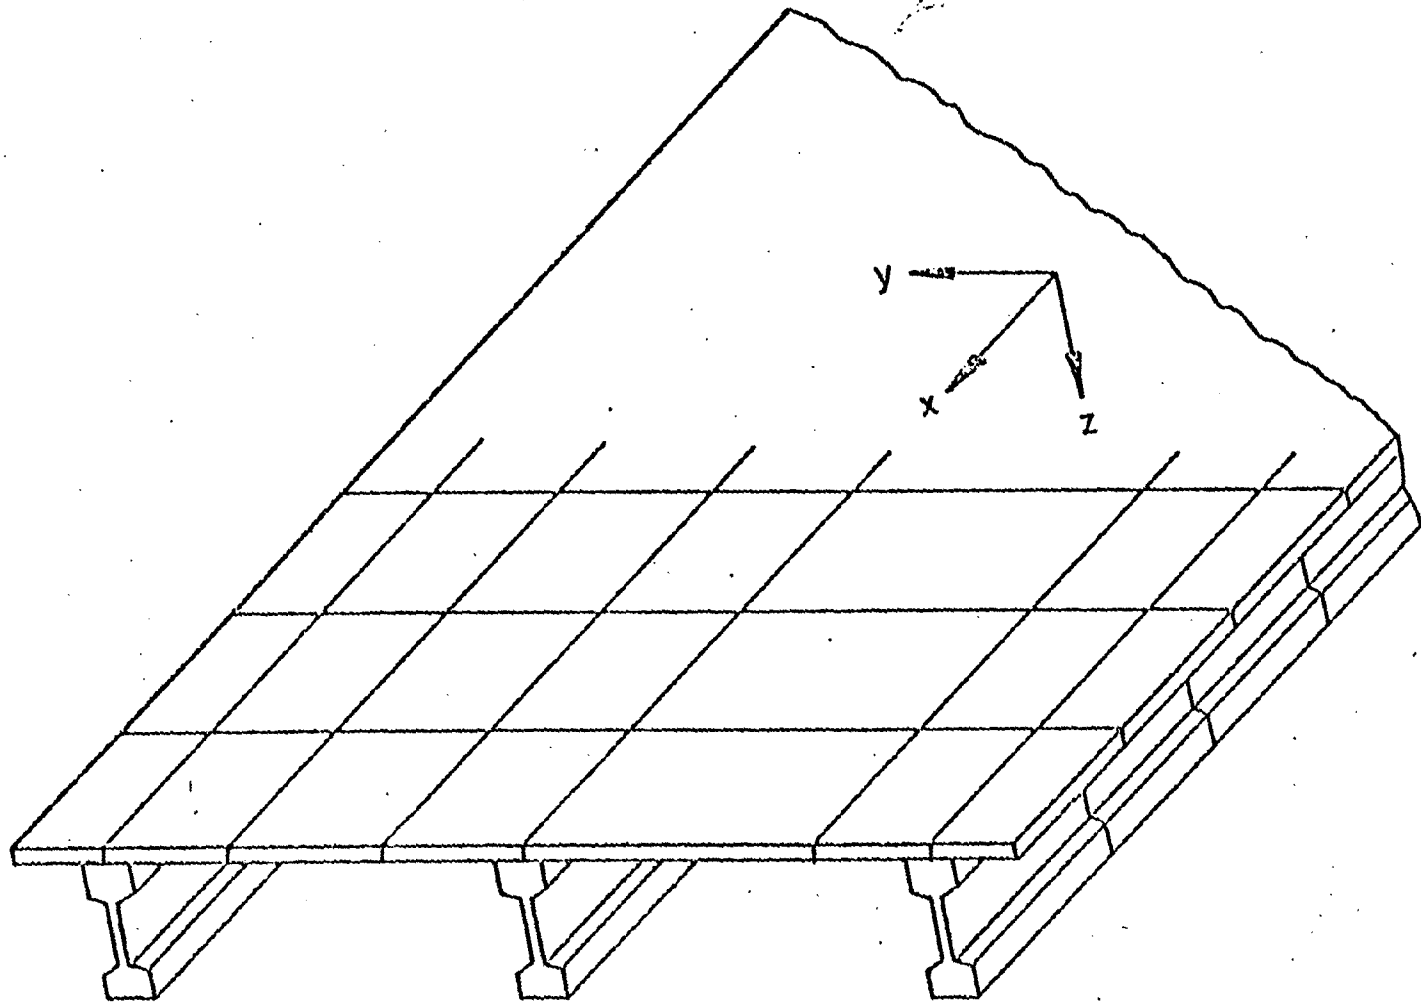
Finite Element Discretization of a Prestressed Concrete I-Beam Bridge
